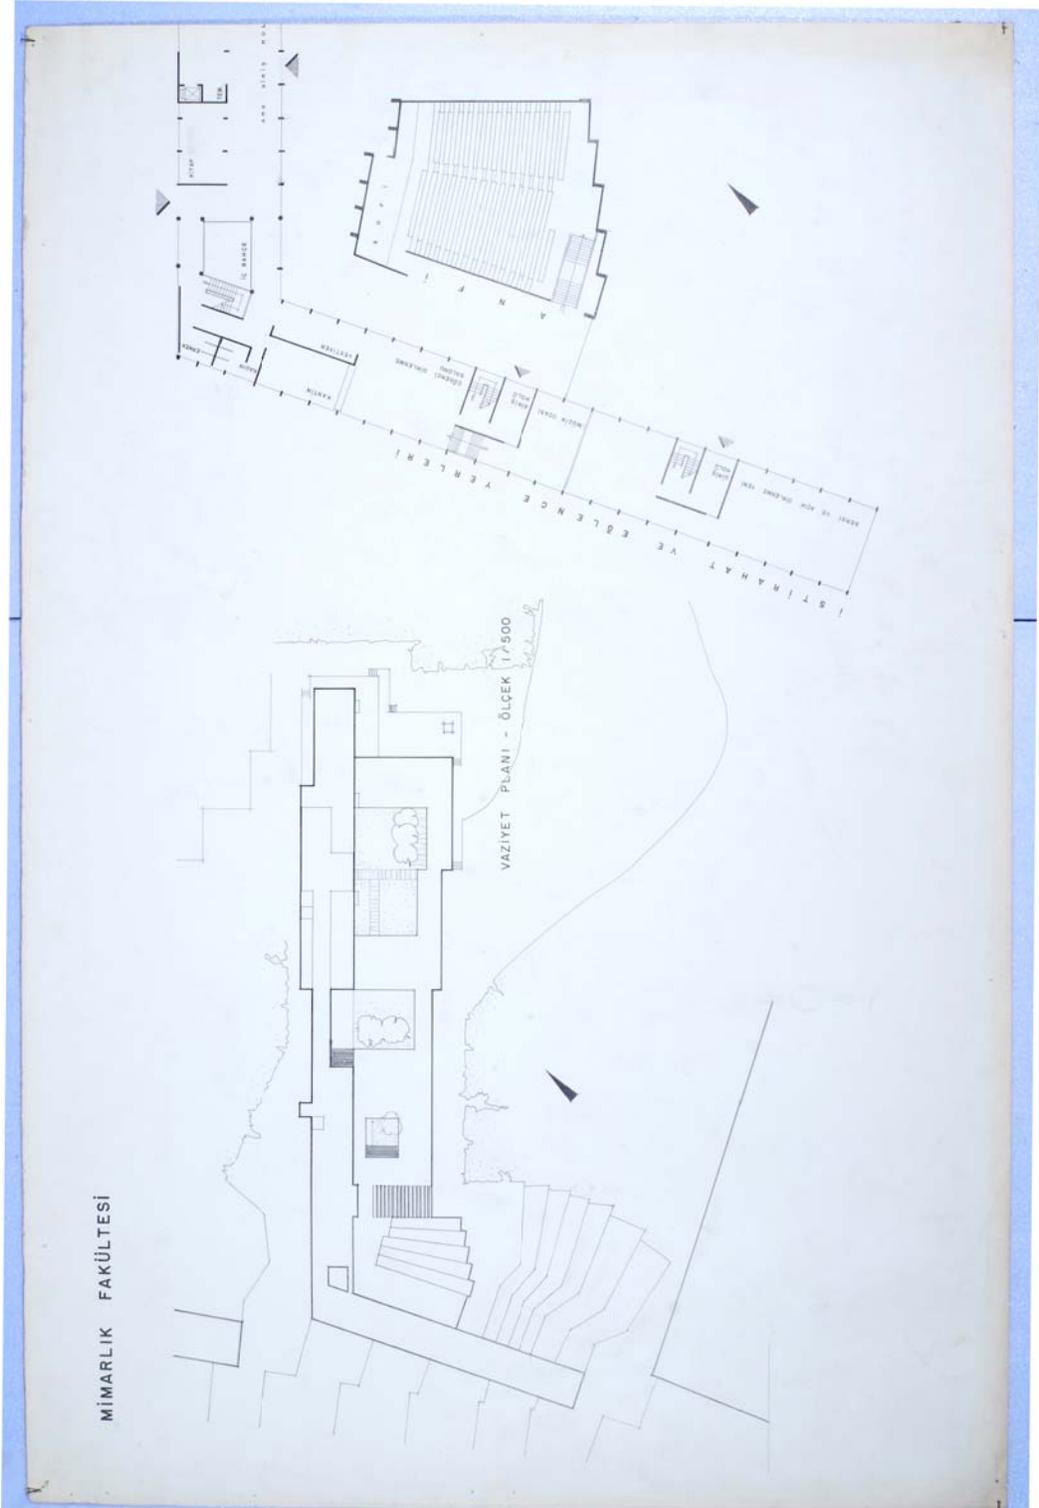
First Floor Plan, part. 1; School of Architecture building; Second Place Winner (project no. 18), Second Competition, Esat Turak, Gürol Gürkan, Önder Sonad, Aktan Yörükoğlu, Osman Armangil (Source: Çinici office archives).
